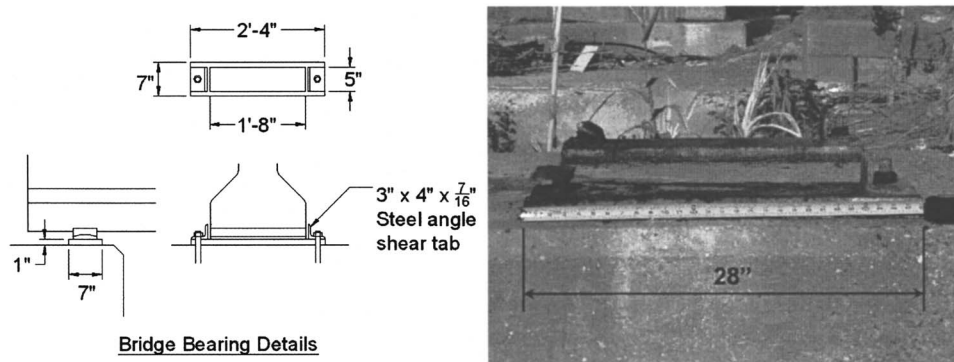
Bearing restraint details for US 90 highway bridge over Biloxi Bay (1 in.=25.4 mm)
